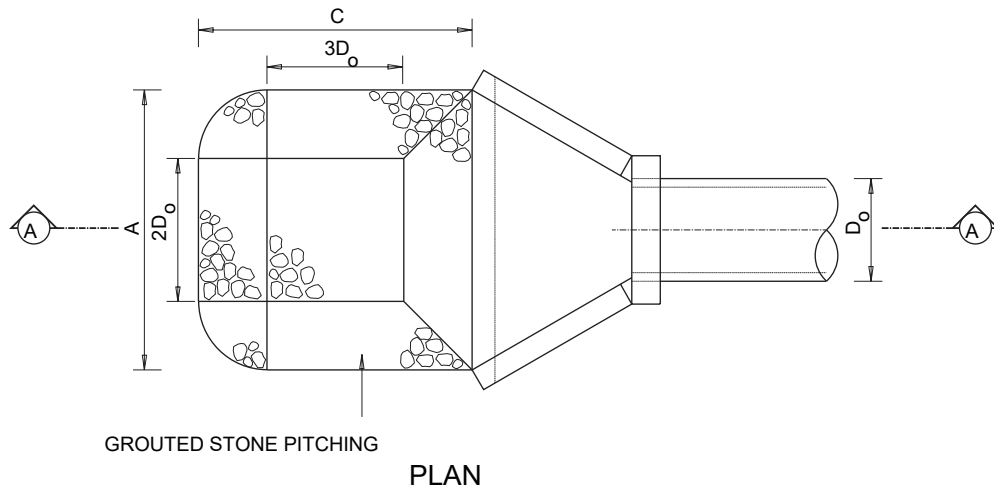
DETAIL DETAIL OF CONCRETE STORMWATER INLET & OUTLET STRUCTURES
